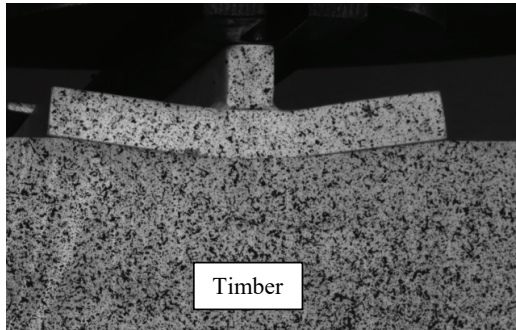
Deformed shape of specimen T15-E4 at maximum force.
